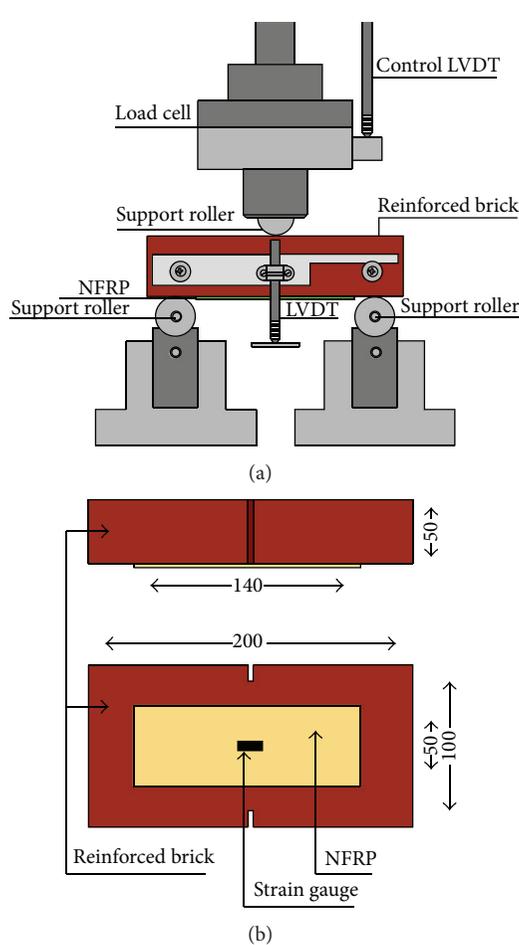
Three points bending test: (a) schematic representation for TPBT and (b) specimen's size, plan view and elevation view.
